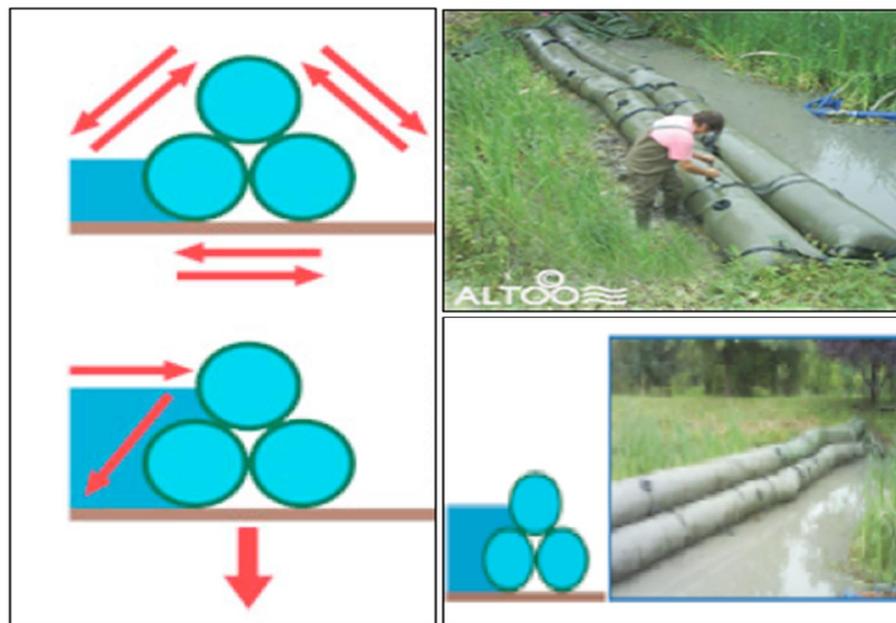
System of barrier used in this case study. (source: [www.altoo-protec-flood.fr](http://www.altoo-protec-flood.fr))
